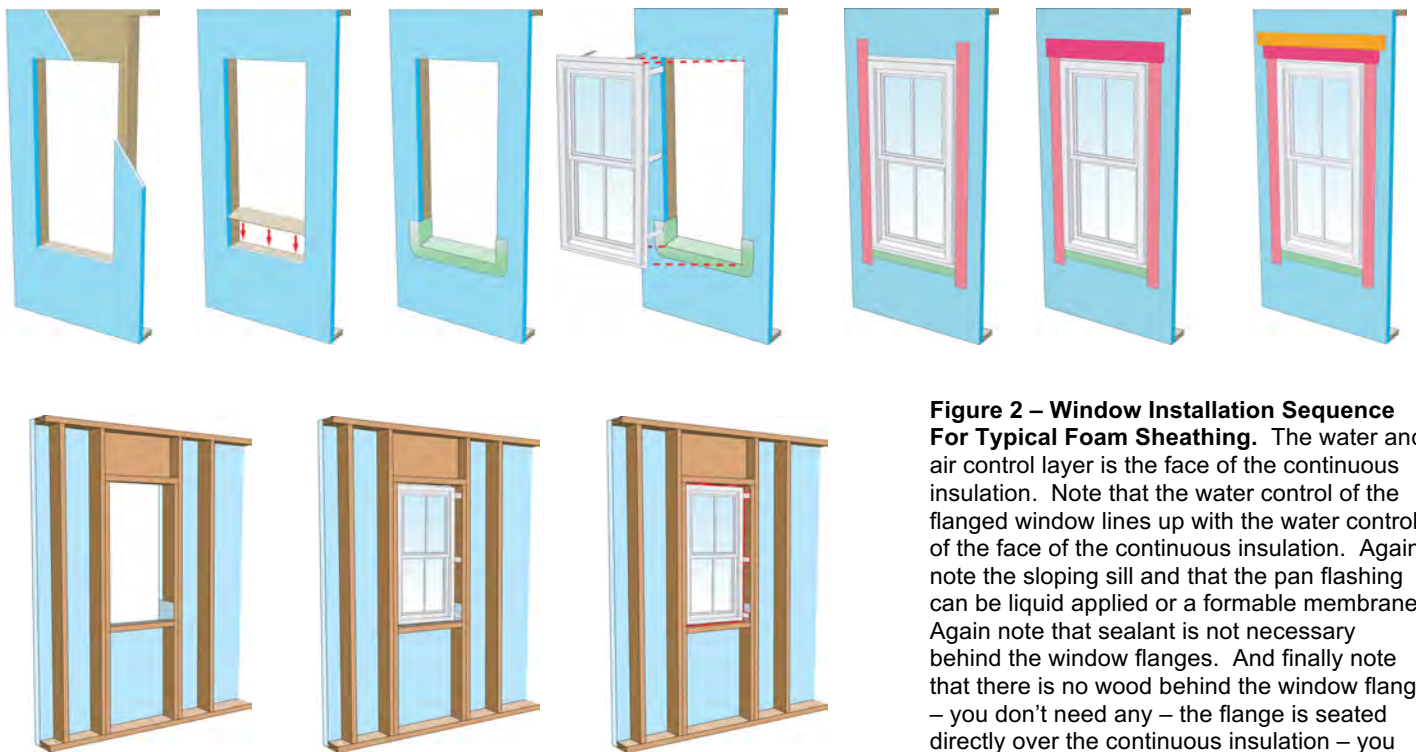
Window Installation Sequence For Typical Foam Sheathing.
